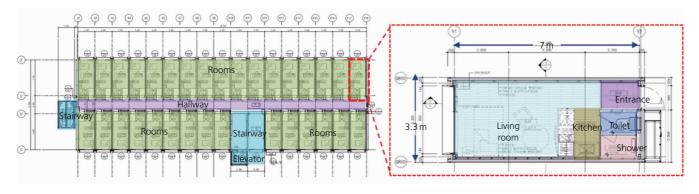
Diagram of second-floor plan of the modular hotel and an enlargement of the floor plan of a typical module (Shin et al., 2020)
